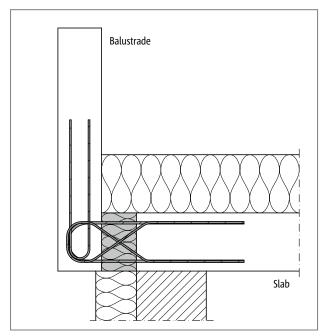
Schöck Isokorb® XT type F: Connection to a corbelled sill with thermal insulation composite system (WDVS)
